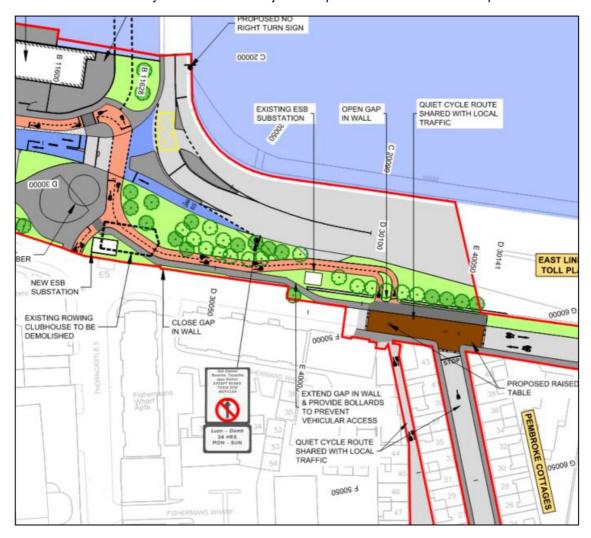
Section 2: Proposed Cycle Route 2a at Tom Clarke Bridge & York Road, Ringsend
